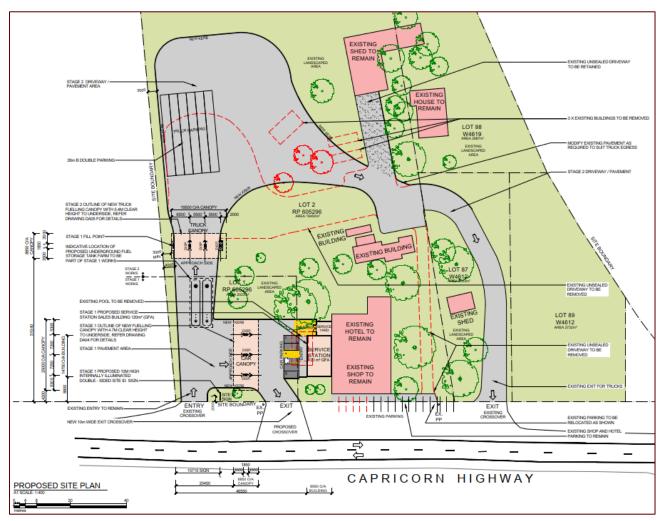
Extract from Site Layout Plan (Dwg. 20-041 – Rev C)
